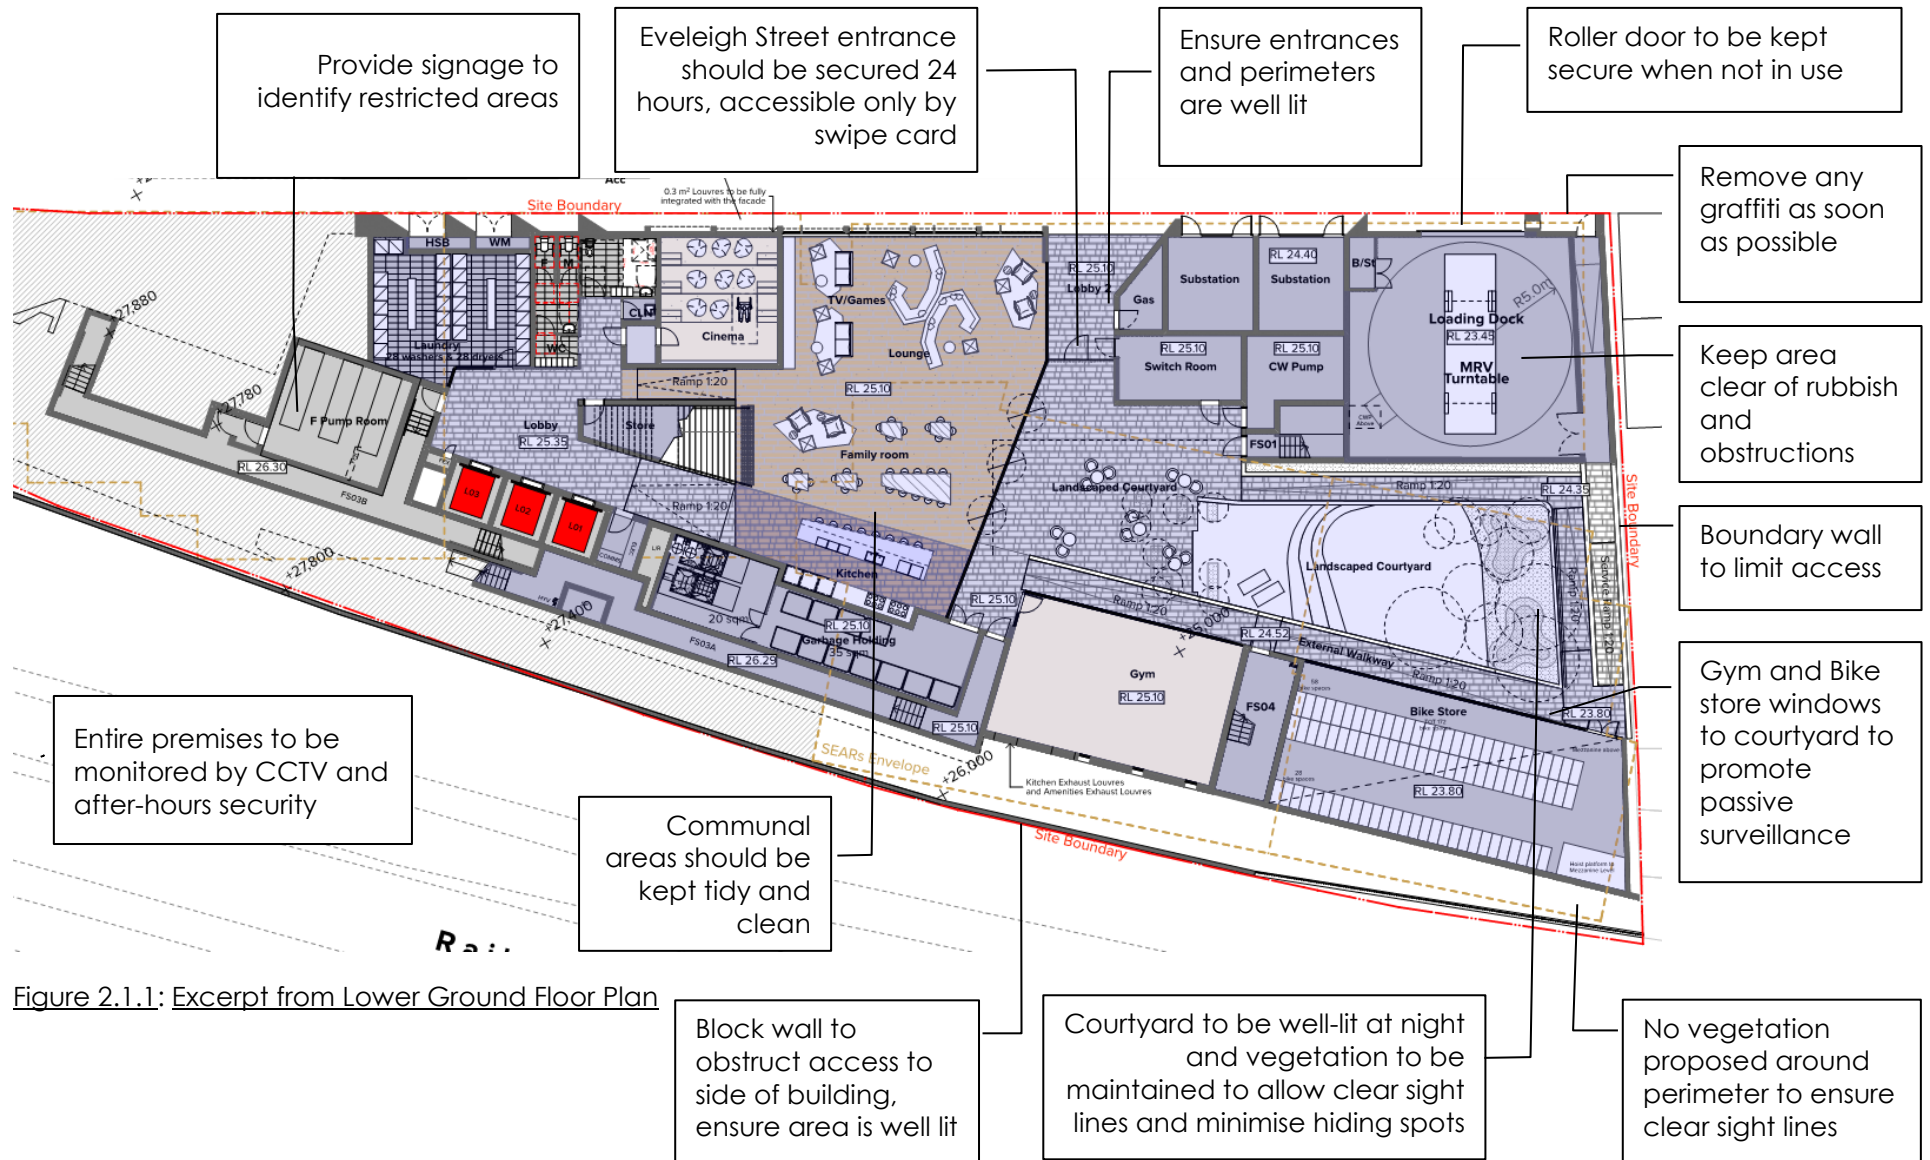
Excerpt from Lower Ground Floor Plan
